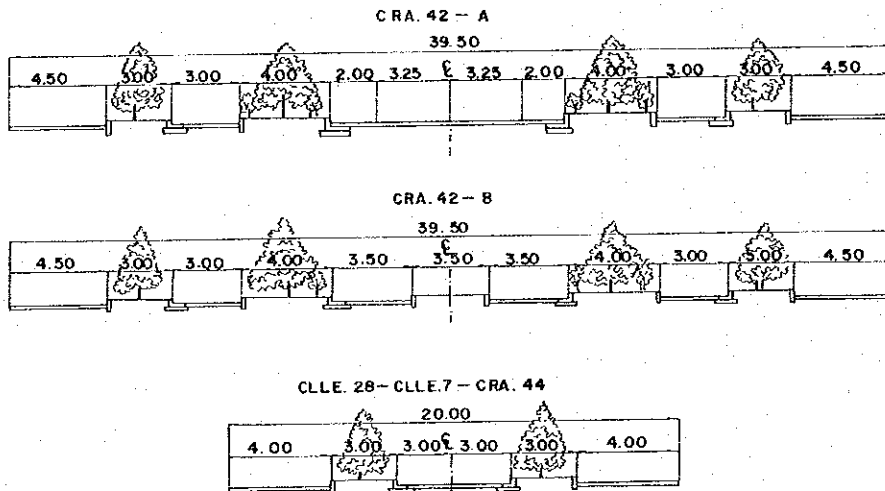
TYPICAL CROSS SECTION OF PEDESTRIAN STREET
